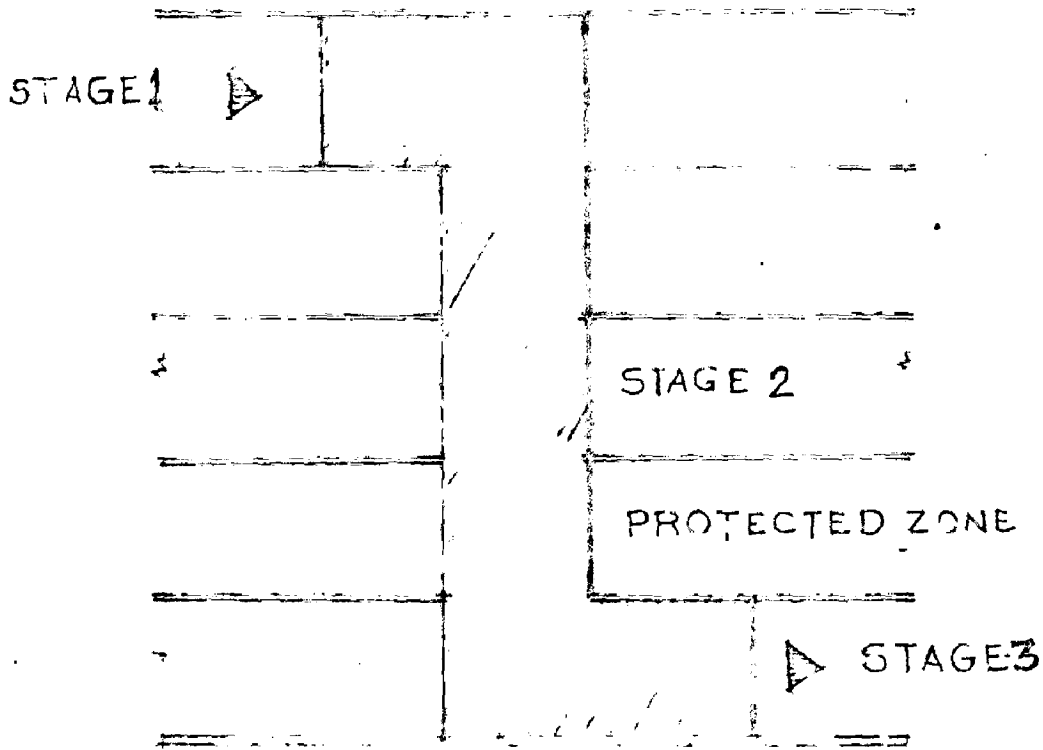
/A THE BASIC STAGES OF AN ESCAPE ROUTE IN BUILDING
